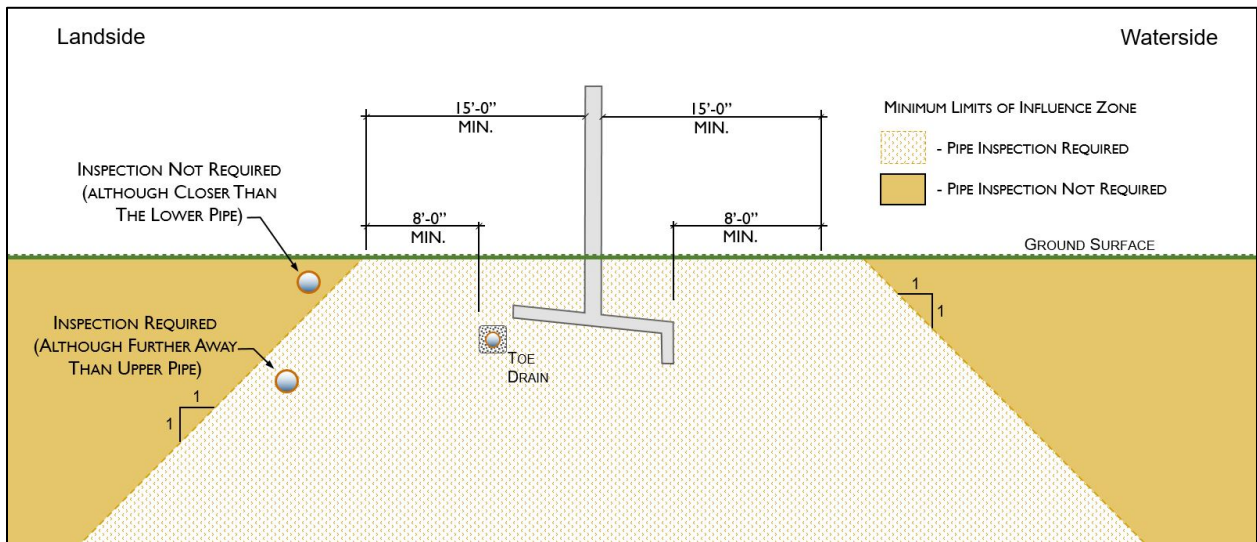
Gravity pipes adjacent to a floodwall (T-wall).
